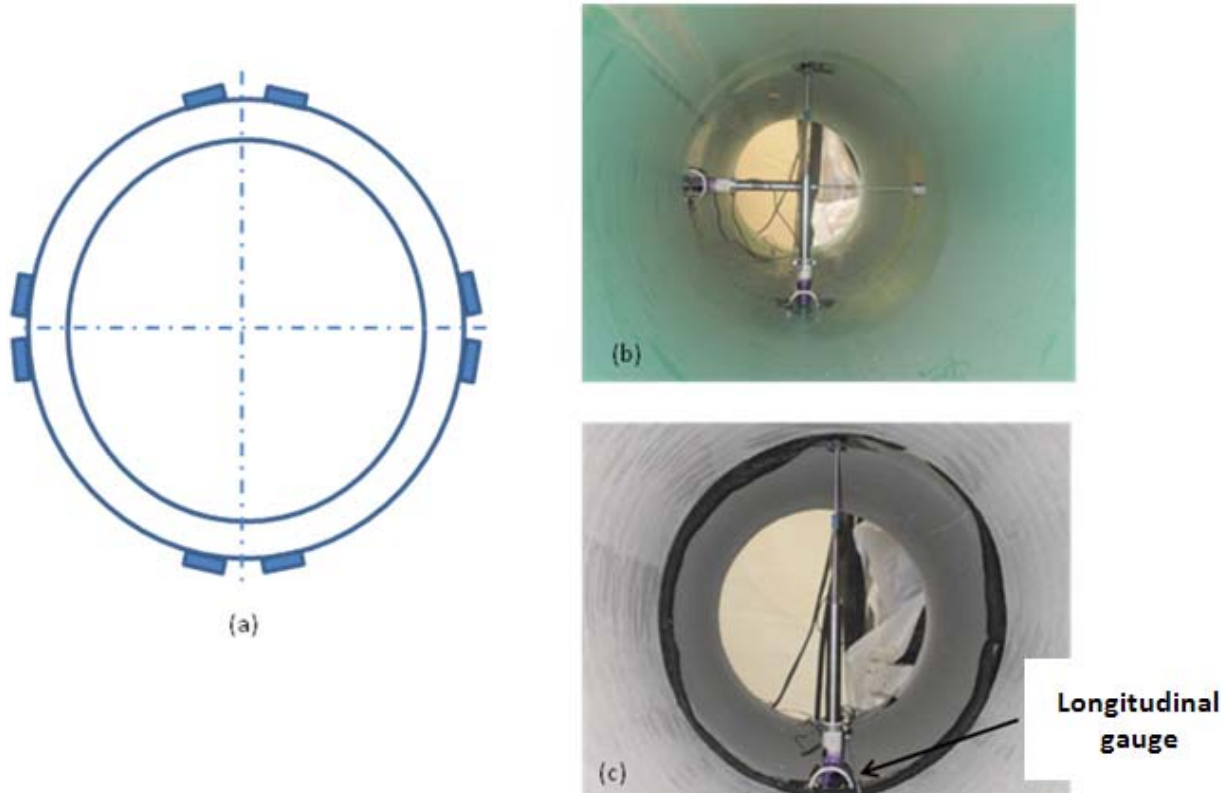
Layout of Instrumented Sensors: (a) 8 Strain Gauges for Unjointed PVC Pipe; (b) 2 LVDTs for Unjointed PVC Pipe; (c) Vertical and Longitudinal LVDTs for Jointed Concrete Pipe.
